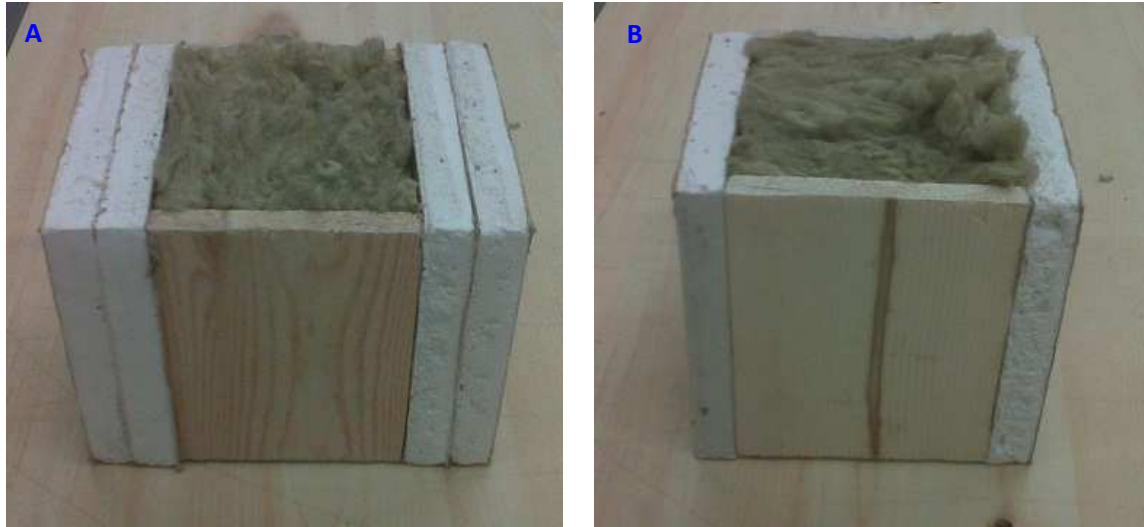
Wall Assembly Specimen (A – Double Layers of Gypsum Board, B – Single Layer of Gypsum Board)
